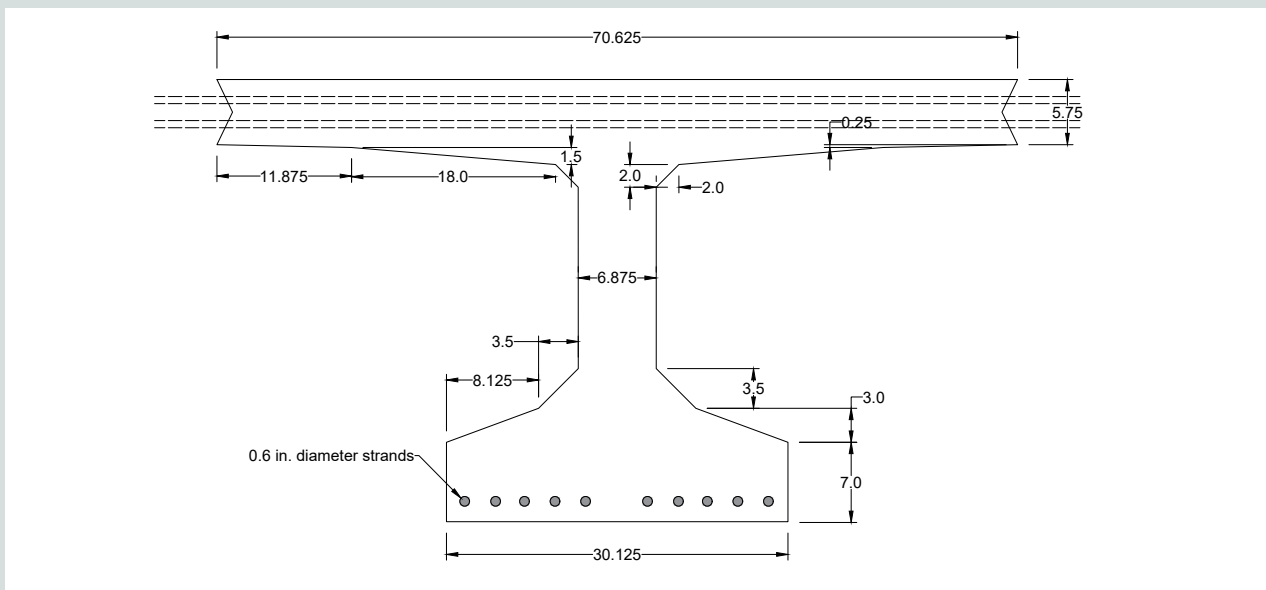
Precast concrete economical fabrication 39 cross section and longitudinal joint reinforcement detail. Note: all measurements are in inches. 1 in. = 25.4 mm.
